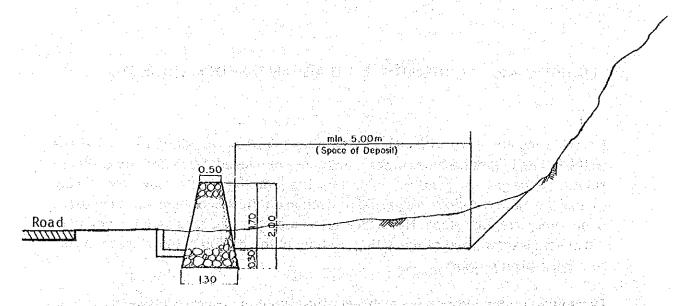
DETAIL OF CATCH WALL AND DEPOSIT SPACE
